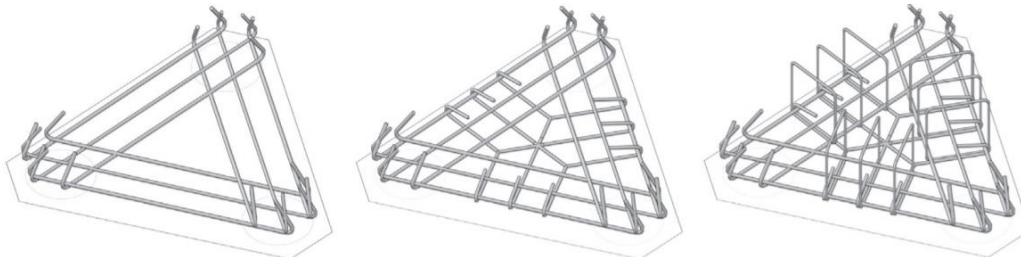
Three different reinforcement layouts adopted for test specimens (Miguel-Tortola et al., 2018)
